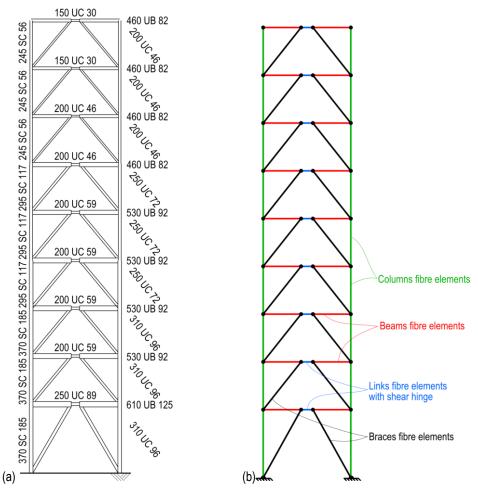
Building G. Sketches of (a) the structural solution and (b) the nonlinear model.
